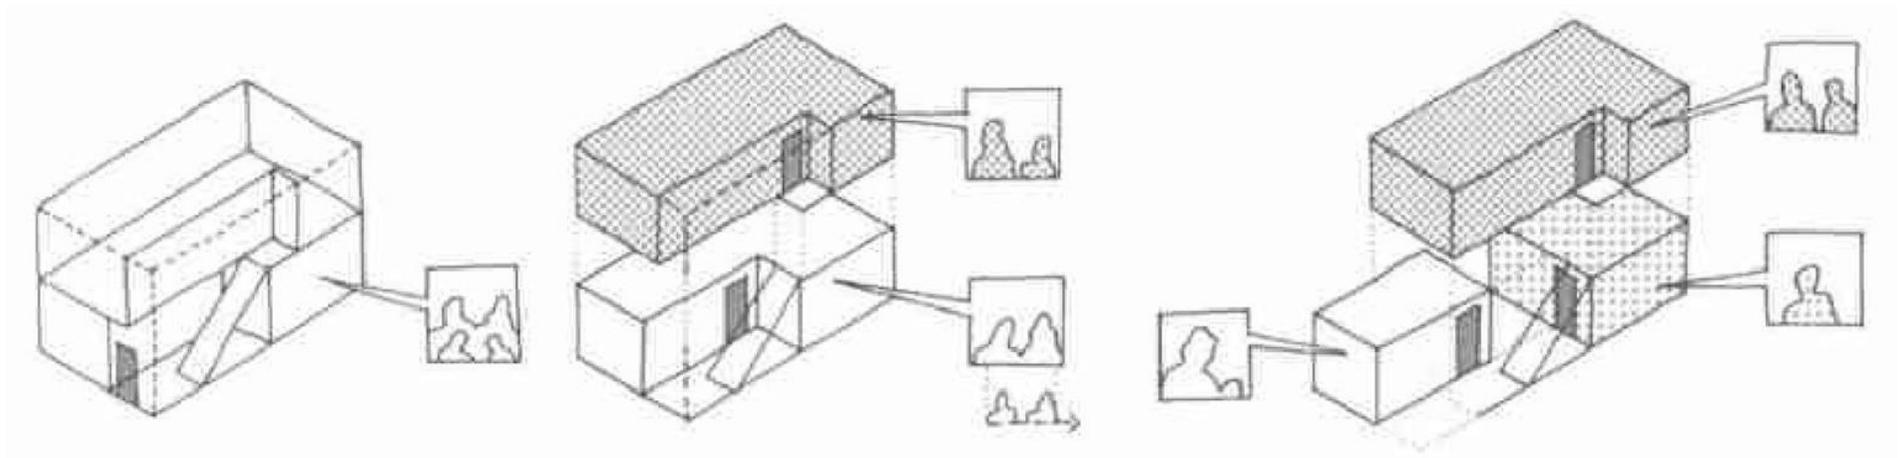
Joining and dividing (Schneider & Till, 2007, p. 188)
